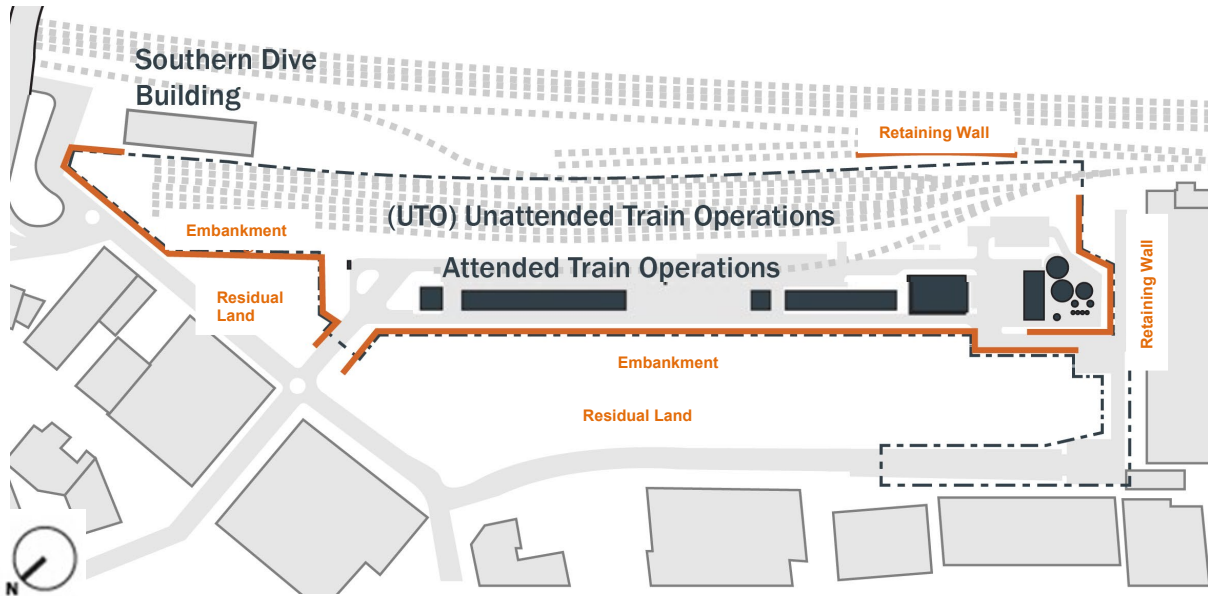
SMTFS and Marrickville Dive – Site adjacencies and locations of retaining walls/embankments
